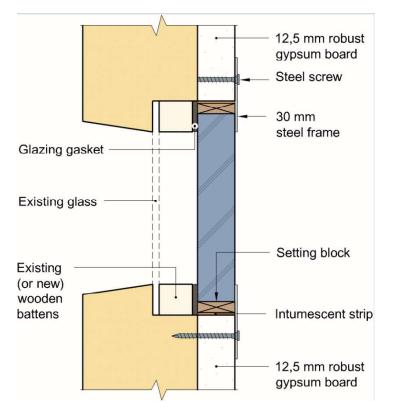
Mounting of fire rated glass outside rabbet with steel frame
